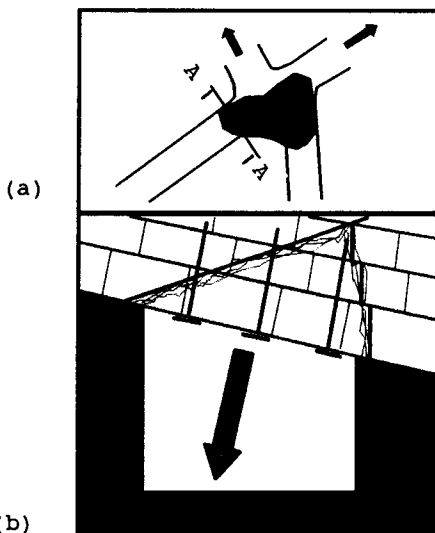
Roof failure due to critical joints (a. Plan view, b. Cross section A-A).
